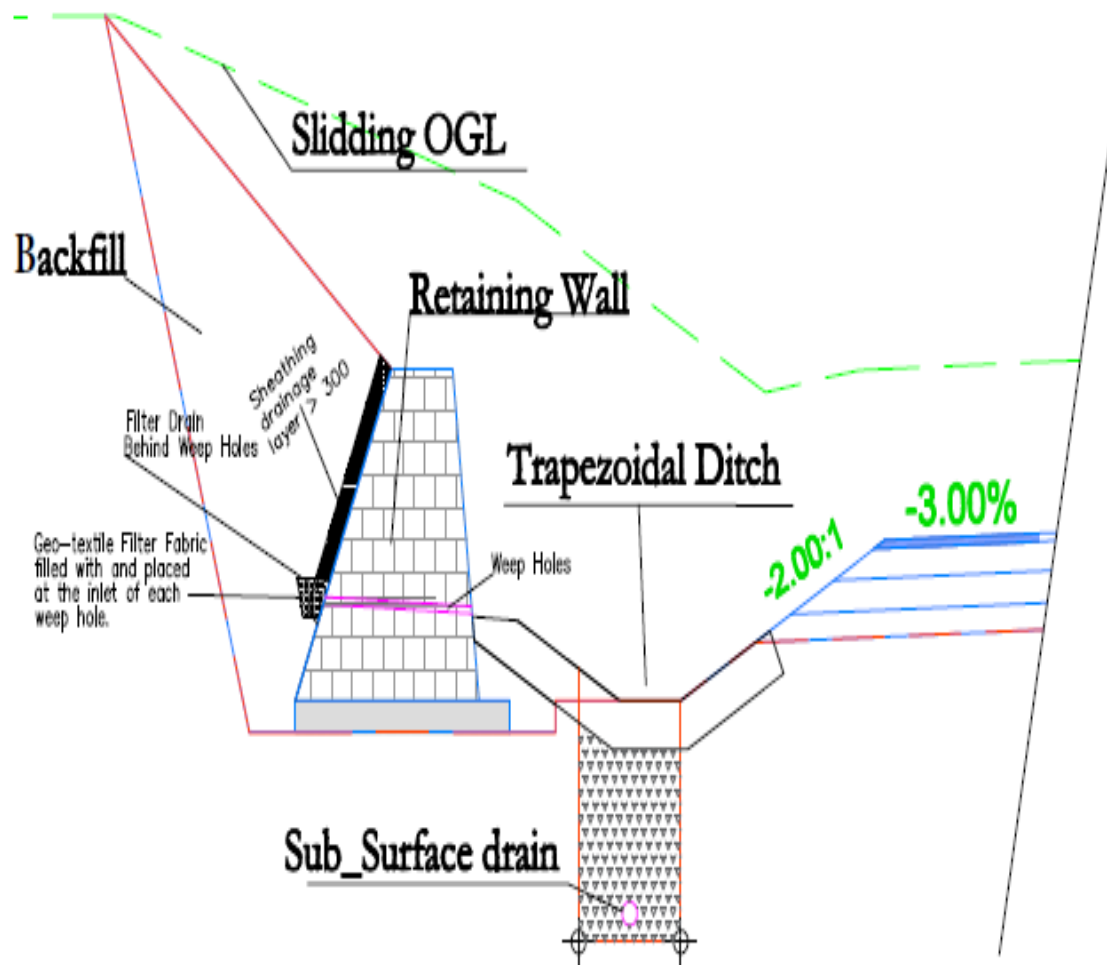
Retaining Wall Subsurface Drane & Gabion Wall with km 80+700- 83+400
